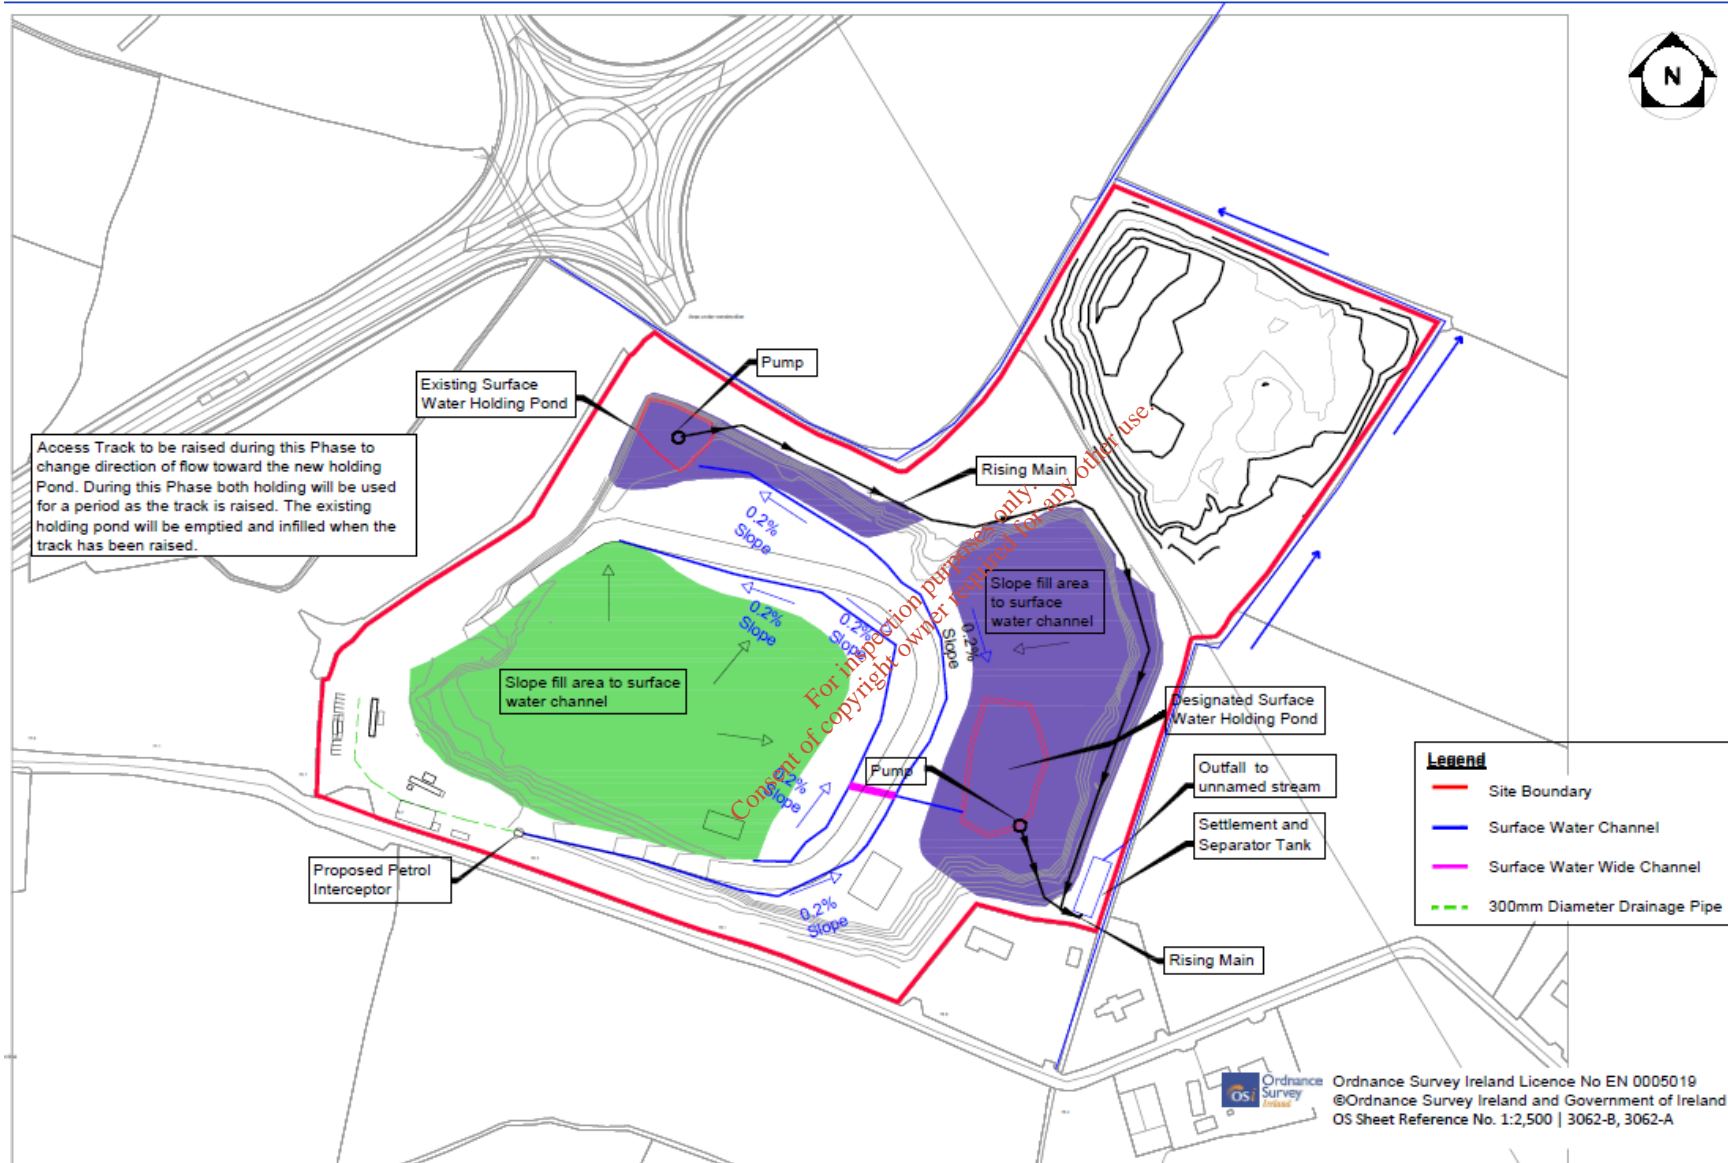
Proposed Drainage Layout Phases 1 and 2
